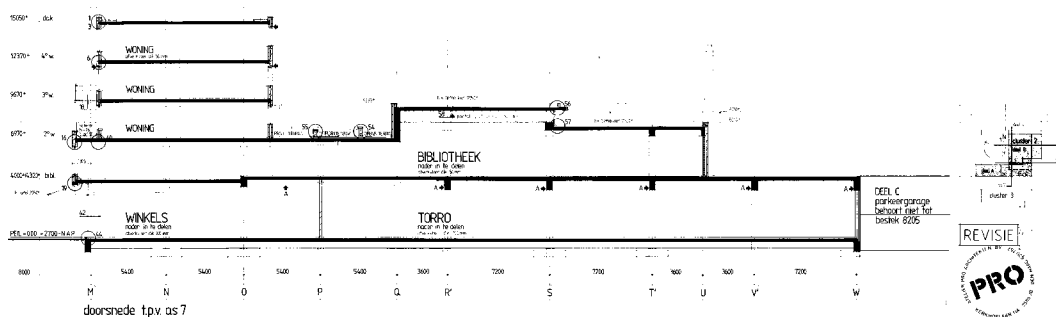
Section of building with retail, library, dwellings and deck Bijlmerplein, Amsterdam Zuidoost, Atelier PRO, 1987
